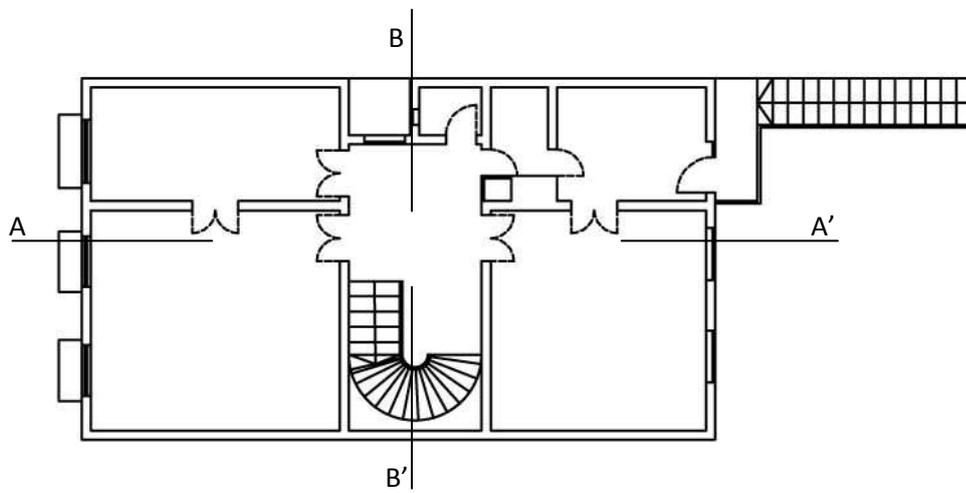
Ground (entrance) floor plan of the house at 117 lot 6 parcel
